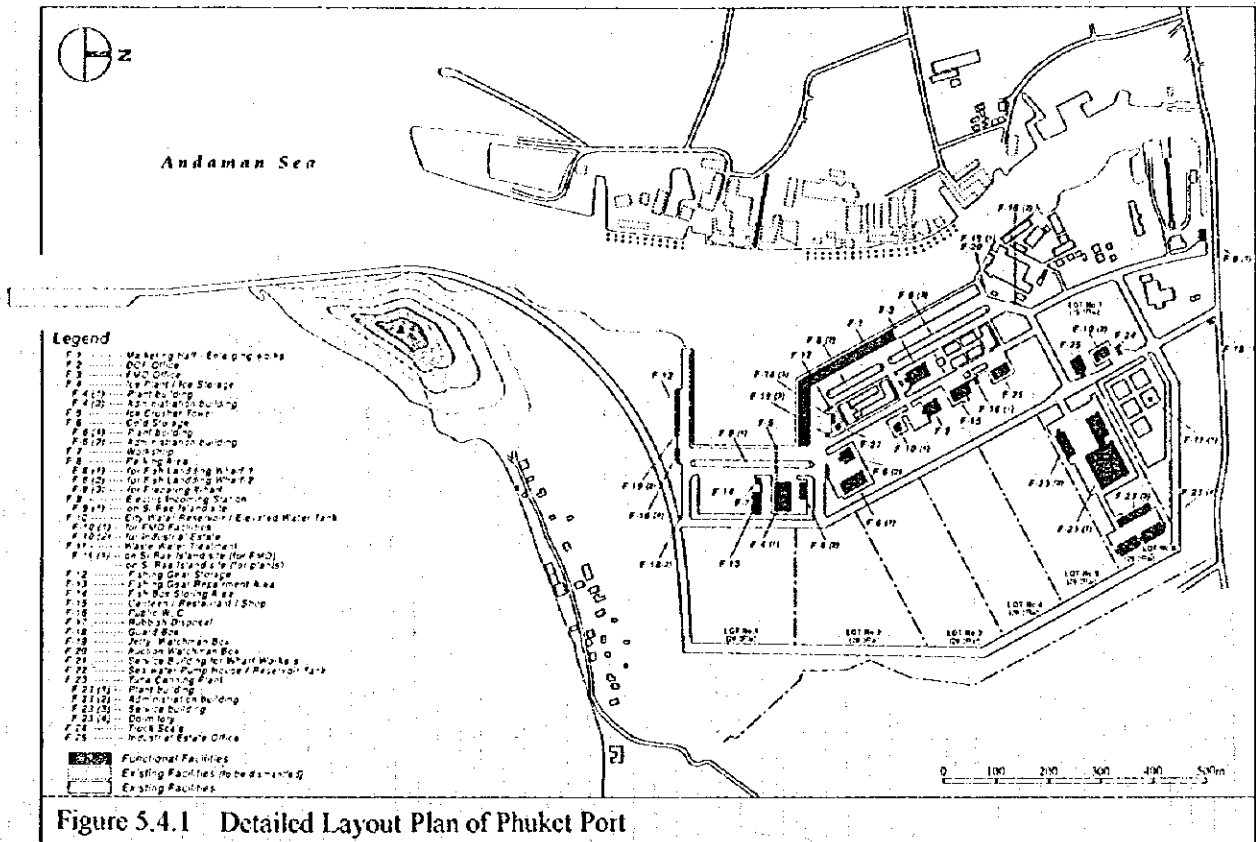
Detailed Layout Plan of Phuket Port
